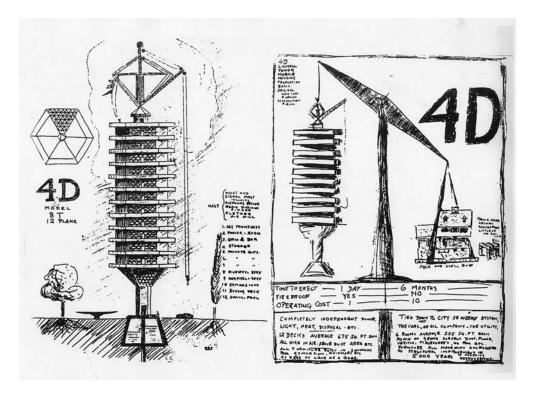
Buckminster Fuller's sketch of the 4D tower and a traditional house on a scale (circa 1928). Fuller claimed that it would take only a day to build the 4D tower, as opposed to the much longer construction time of a traditional single-family house. The 4D tower would be "completely independent . . . , light, neat . . . 12 decks average 675 sq. ft. each." In contrast, the traditional house would be "tied down to city sewerage system, the coal, or oil company—the utility, 6 rooms average 225 sq. ft. each. . . . No structural improvement in 5000 years." Reprinted in Joachim Krausse and Claude Lichtenstein, eds., Your Private Sky: R. Buckminster Fuller, the Art of Design Science (Lars Müller Publishers, 1999), 96. Courtesy of The Estate of R. Buckminster Fuller.
